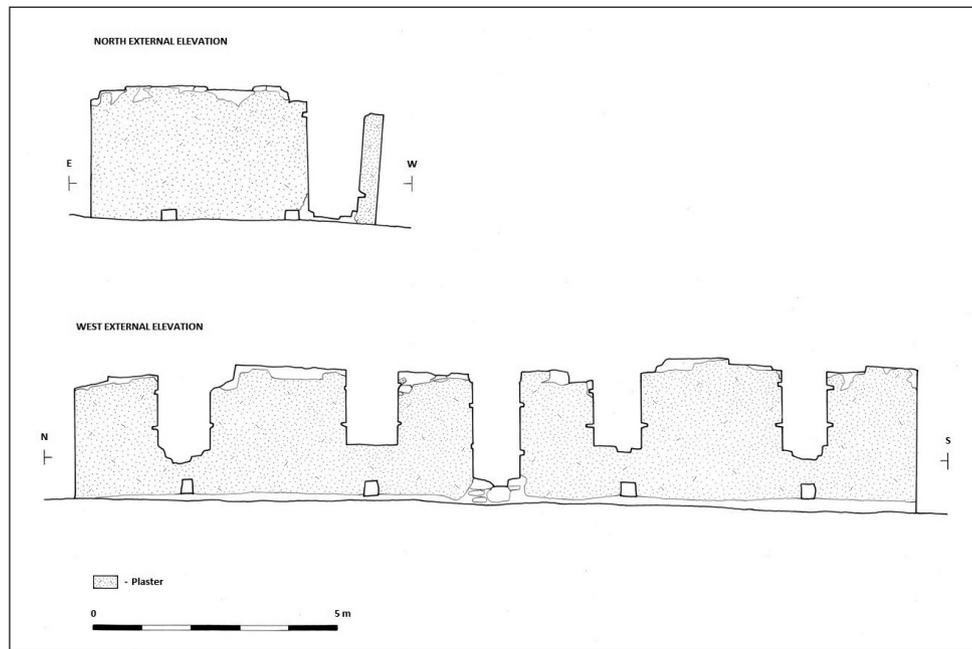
North and west external elevations (J. Flexner and M. Jones).
